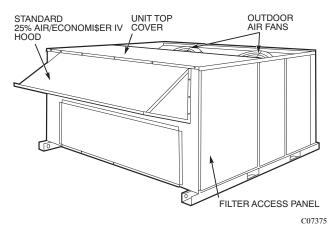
Base Unit Details (13 to 25 Ton Units)
